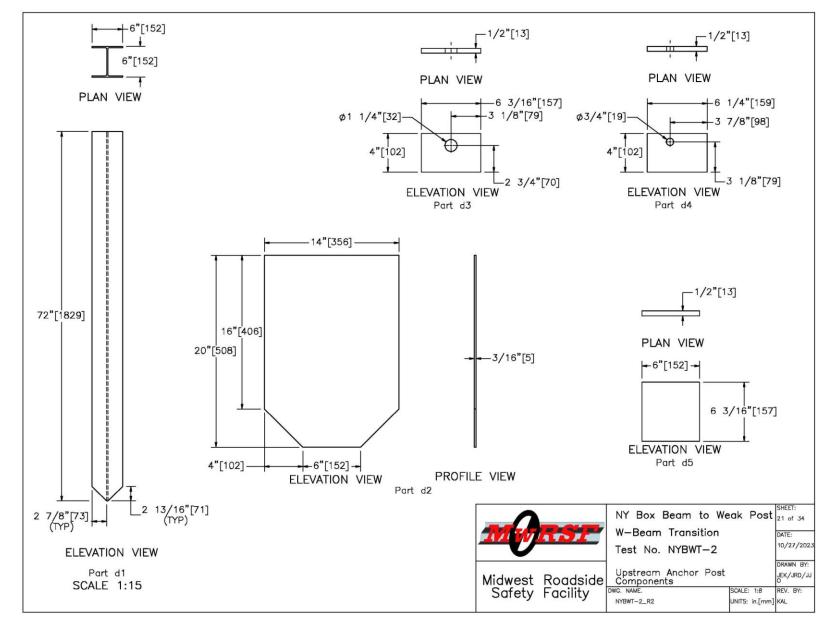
HFT Anchor Assembly Components, Test No. NYBWT-2
